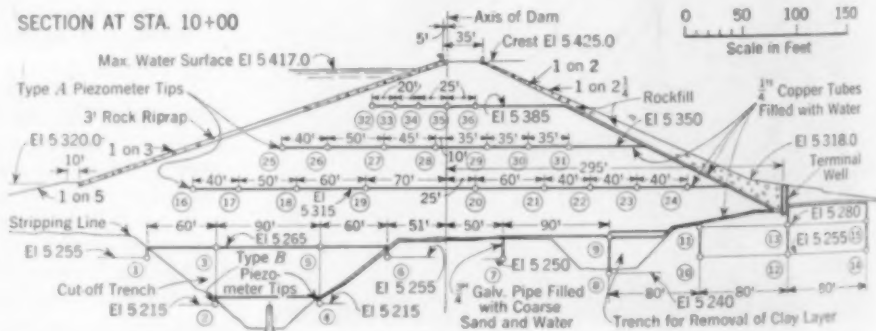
PIEZOMETER INSTALLATIONS IN THE PLANE OF STA. 10+00
